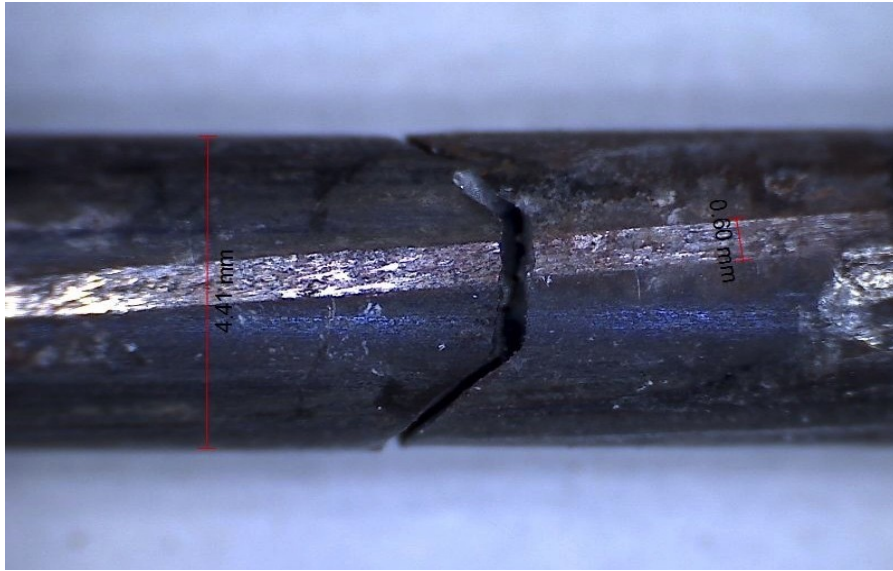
Close of the centre wire of a 7-wire prestressing strand at the failure location as extracted from the beam after failure
